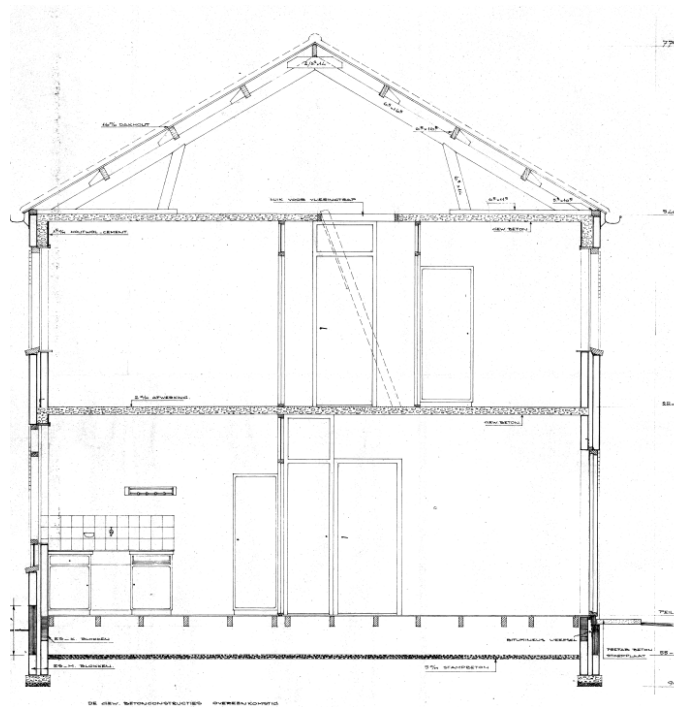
SECTION - SINGLE TERRACED HOUSE
